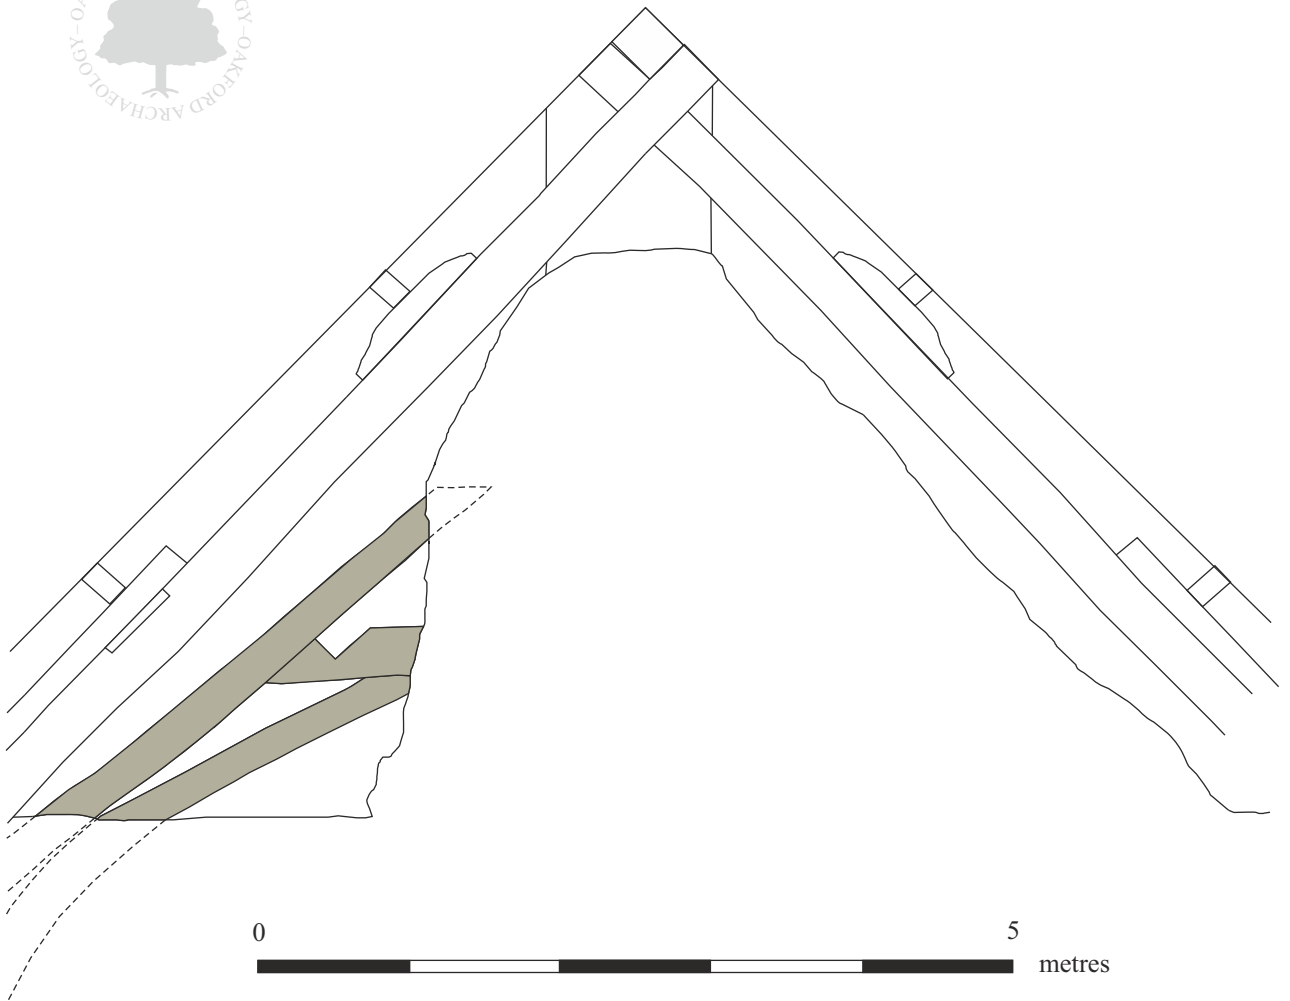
Section showing medieval roof truss (grey) and later roof arrangement.
